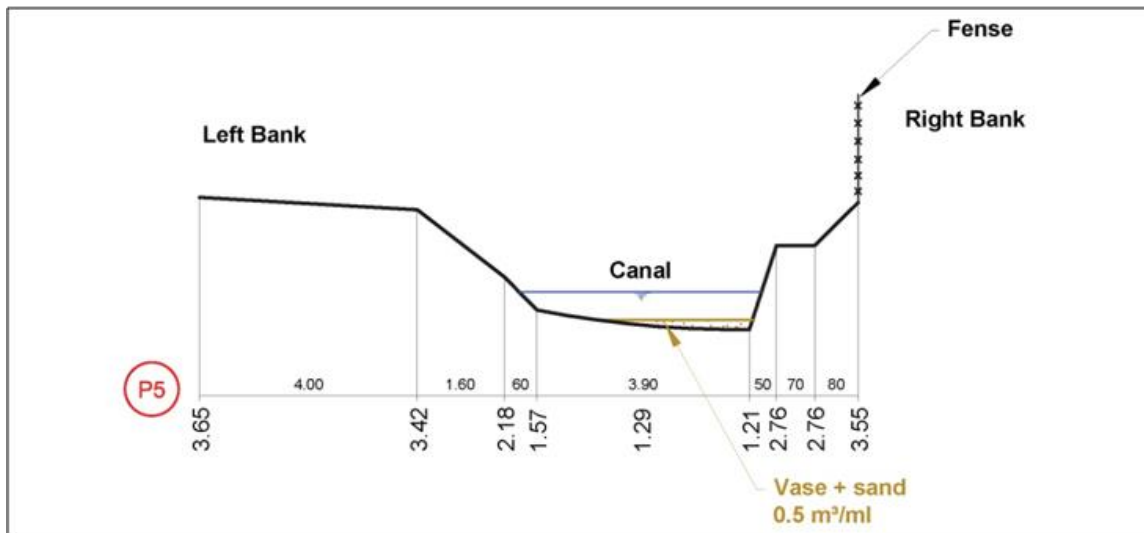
Cross section of the reconstructed canal de Port Punay
